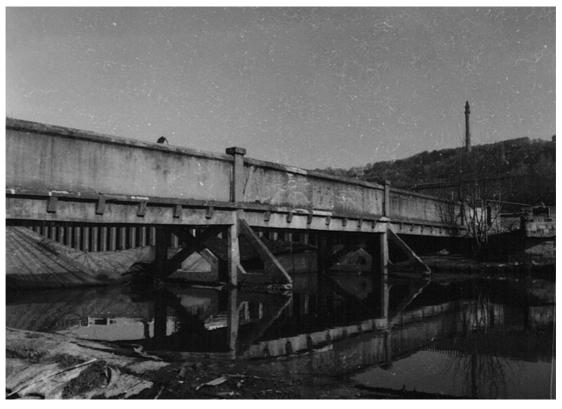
North-facing view showing south-east-facing bridge elevation, trestles (4a) and (4b), and cut-waters (5) and (5a) (MF SB03_06)
